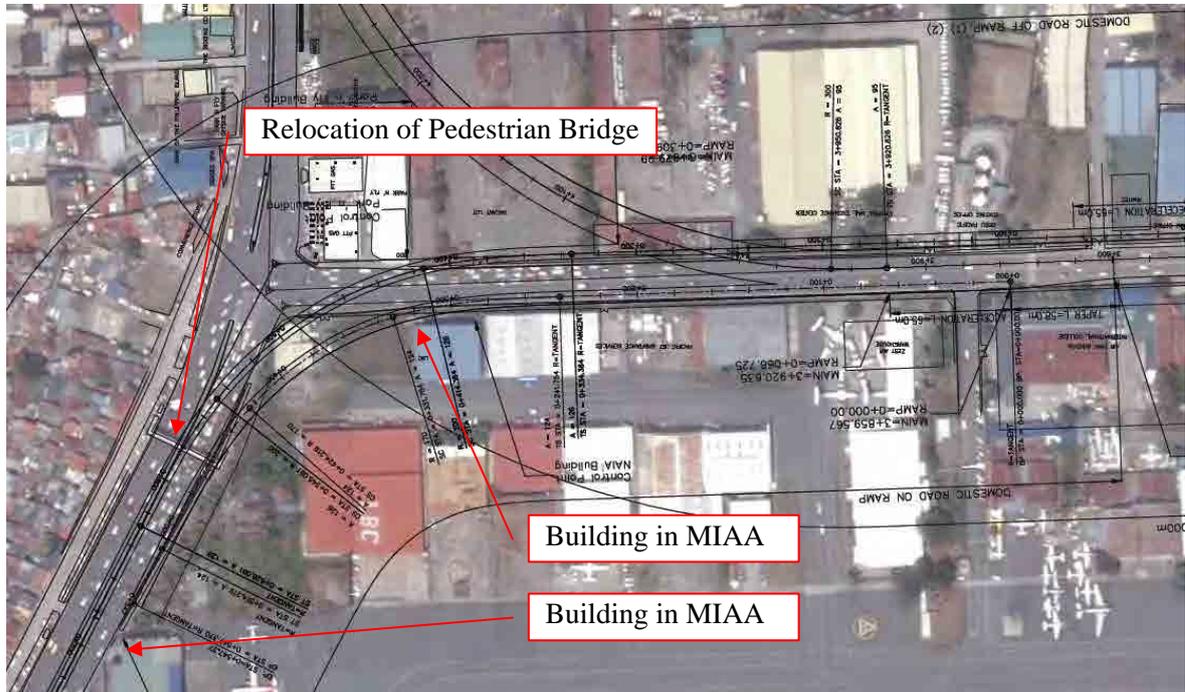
NAIA ROAD ON RAMP
